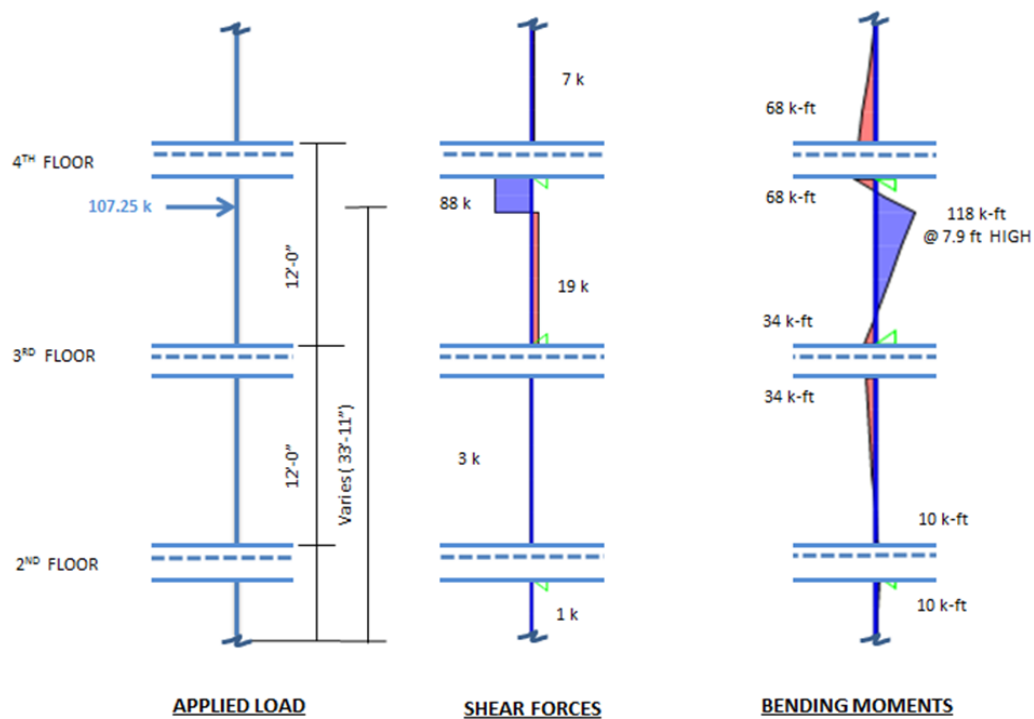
Impact load applied at "d" away from the end of column on the 3rd floor
